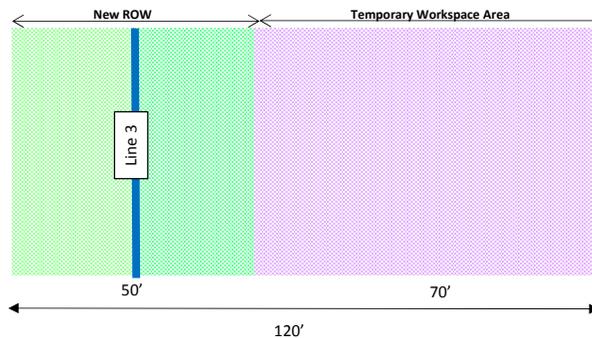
East of Clearbrook Line 3 Construction Workspace (Assumes Sandpiper is Constructed First)
